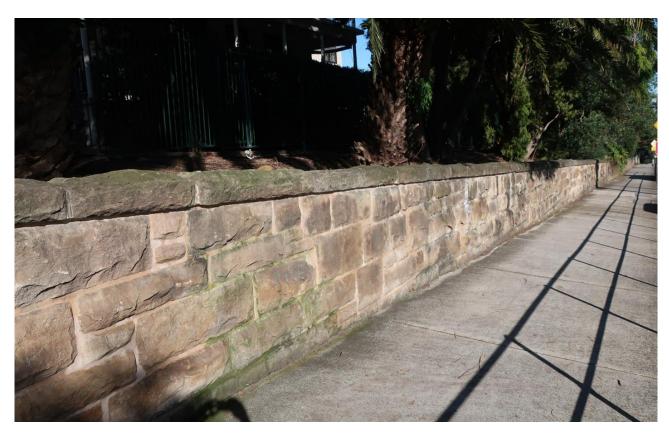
the section of the sandstone wall along the western boundary of the subject site, facing Burns Bay Road.
